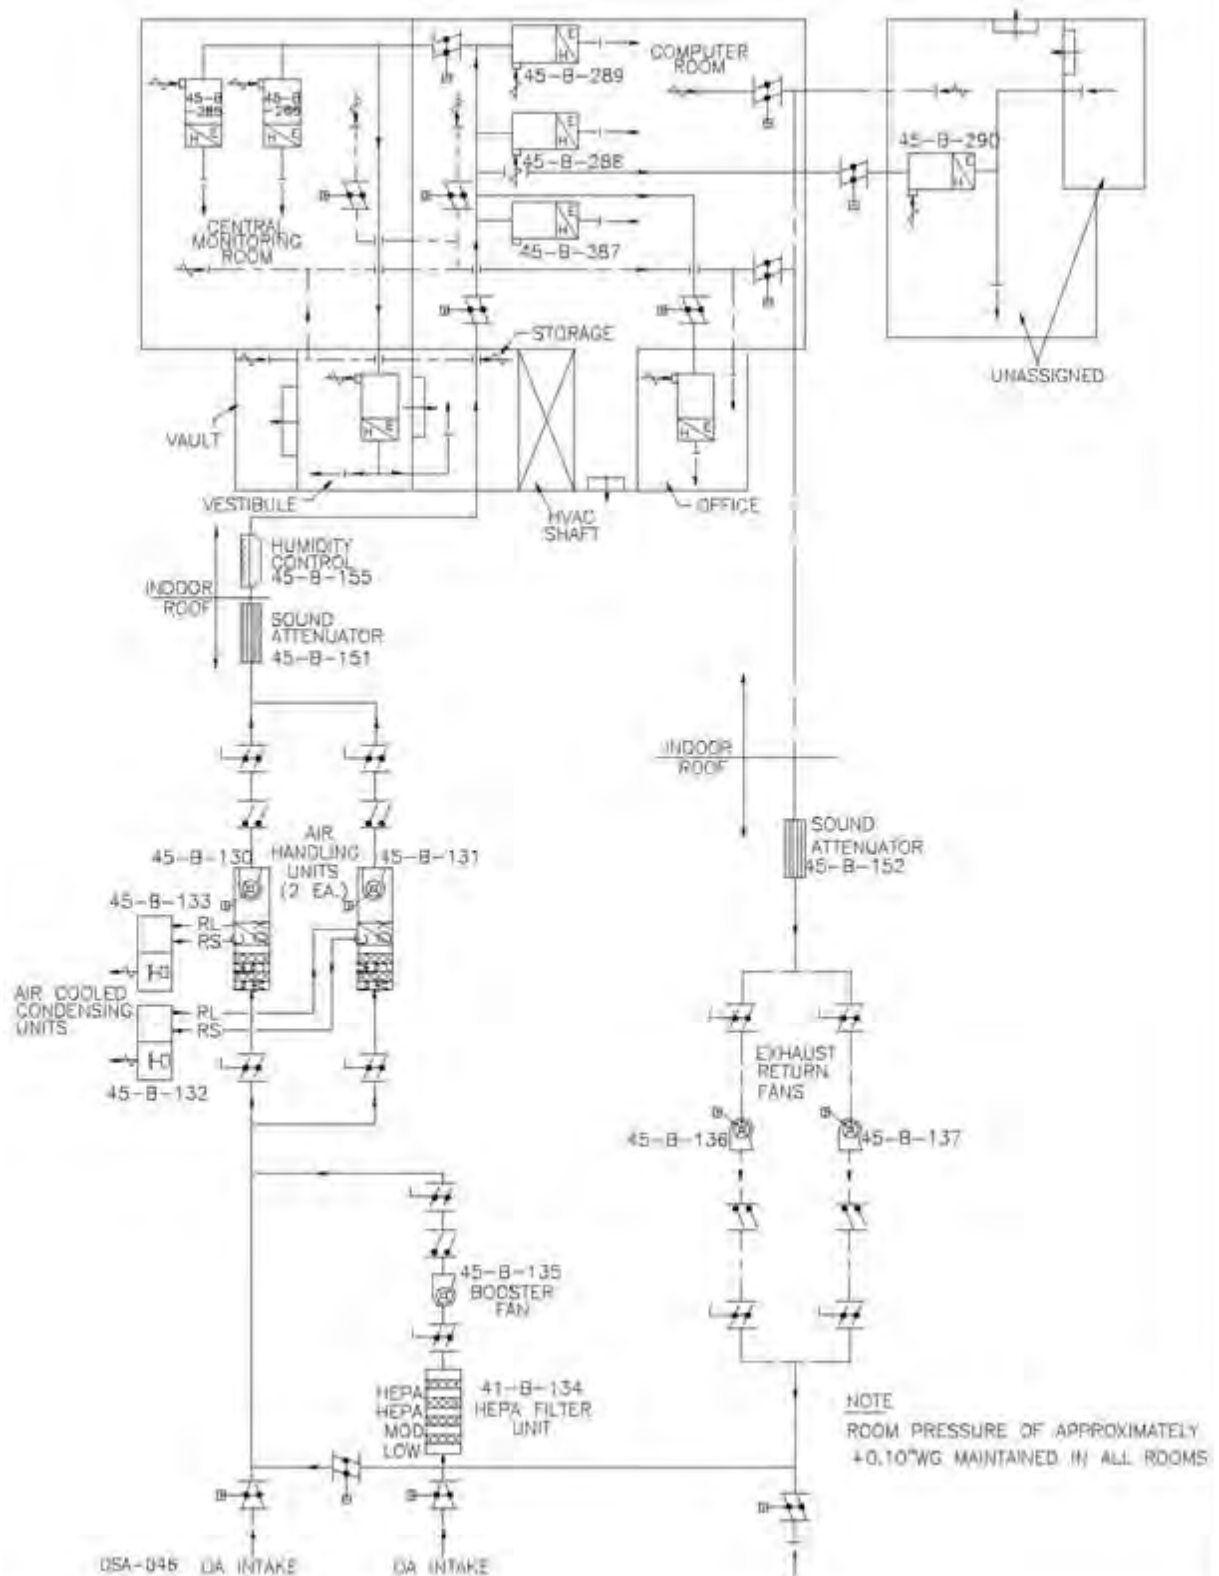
Support Building Central Monitoring Room HVAC Flow Diagram
